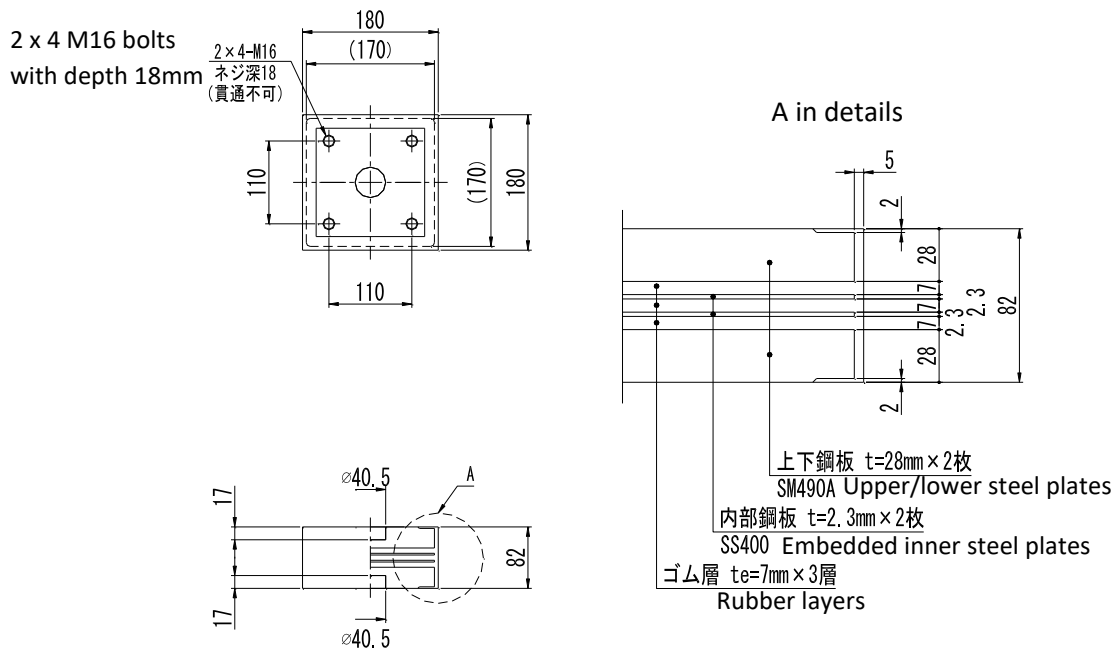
Dimensions of sample bearings (all dimensions in mm).
